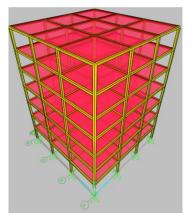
EC8 building reinforcement considerations EC8 (DCM) and EC8 (DCH)
